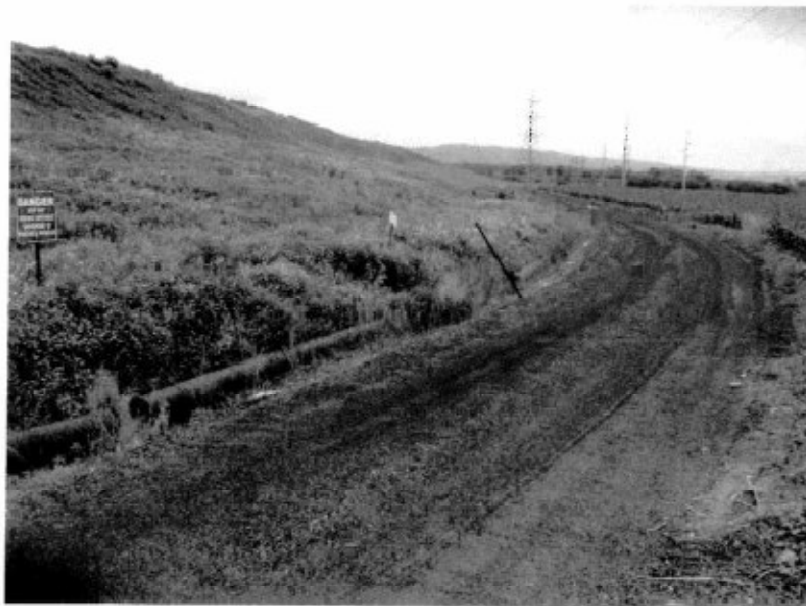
Downstream face of southwest embankment, looking south from Sta 48+00.
